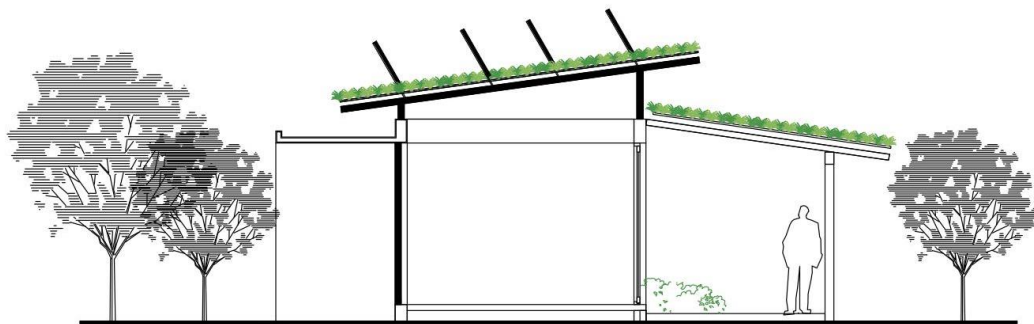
The application of air plant green roofs with a roof slope and solar panel which air plants can reduce the heat and increase the efficiency of the solar panel.
